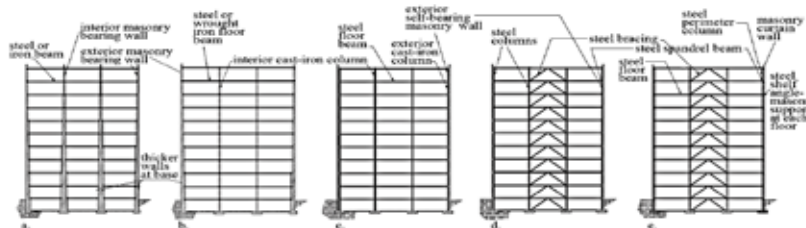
Schematic cross-sections a). Pure bearing-wall building b). Mixed bearing-wall building, c). Wall-braced cage building, d). Frame-braced cage building, e). Skeleton frame building
